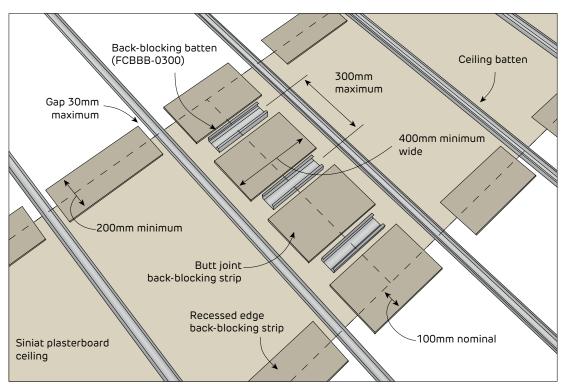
Placement of Back-Blocking Batten and Back-Blocking Strips for Recessed and Butt Joints
